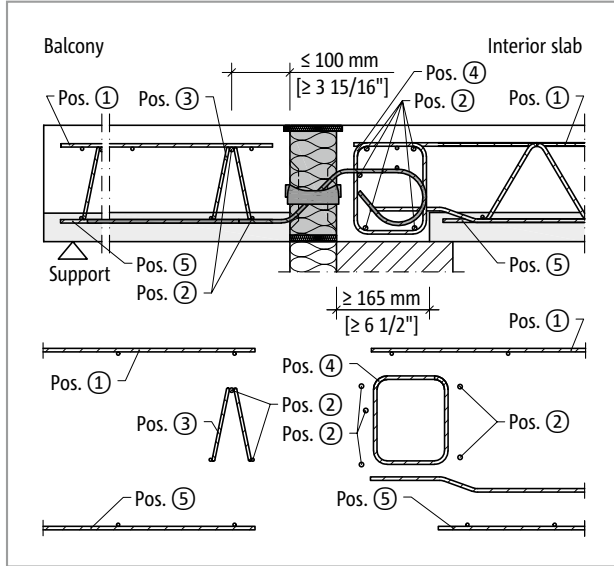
Schöck Isokorb® T Type CQ-V1 to CQ-V5: On-site reinforcement with lattice beam
